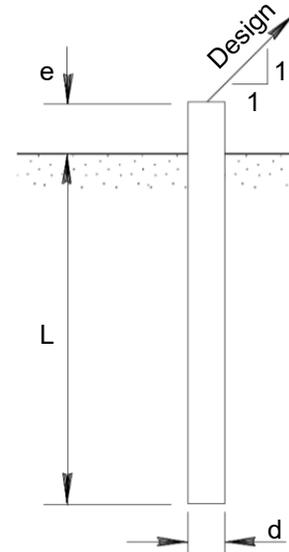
Pile Lateral Loading for Concrete Stress
